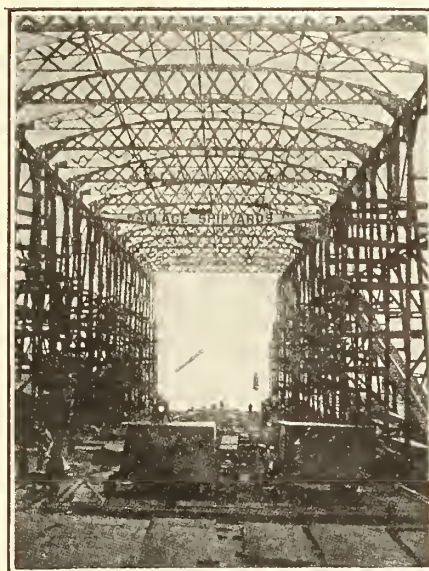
Steel shipbuilding at Wallace Shipyards, Ltd., North Vancouver.
